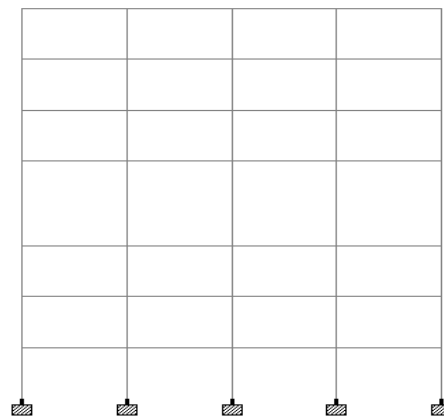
elevation view of building with soft story at middle in STAAD.Pro
